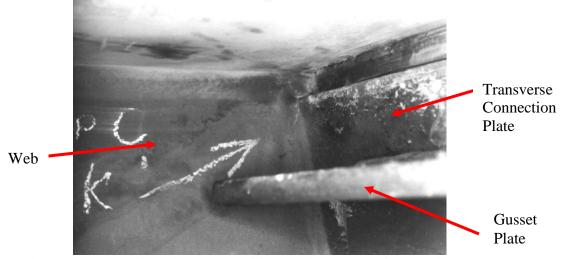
Web Cracking at Box Girder Diaphragm Connection Plate
